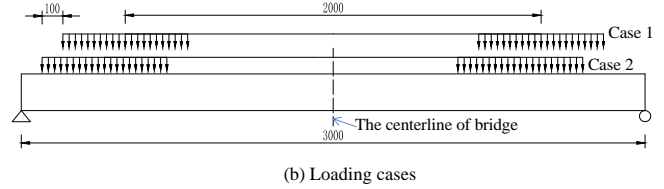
Schematic diagram of fatigue load layout (unit: mm)
